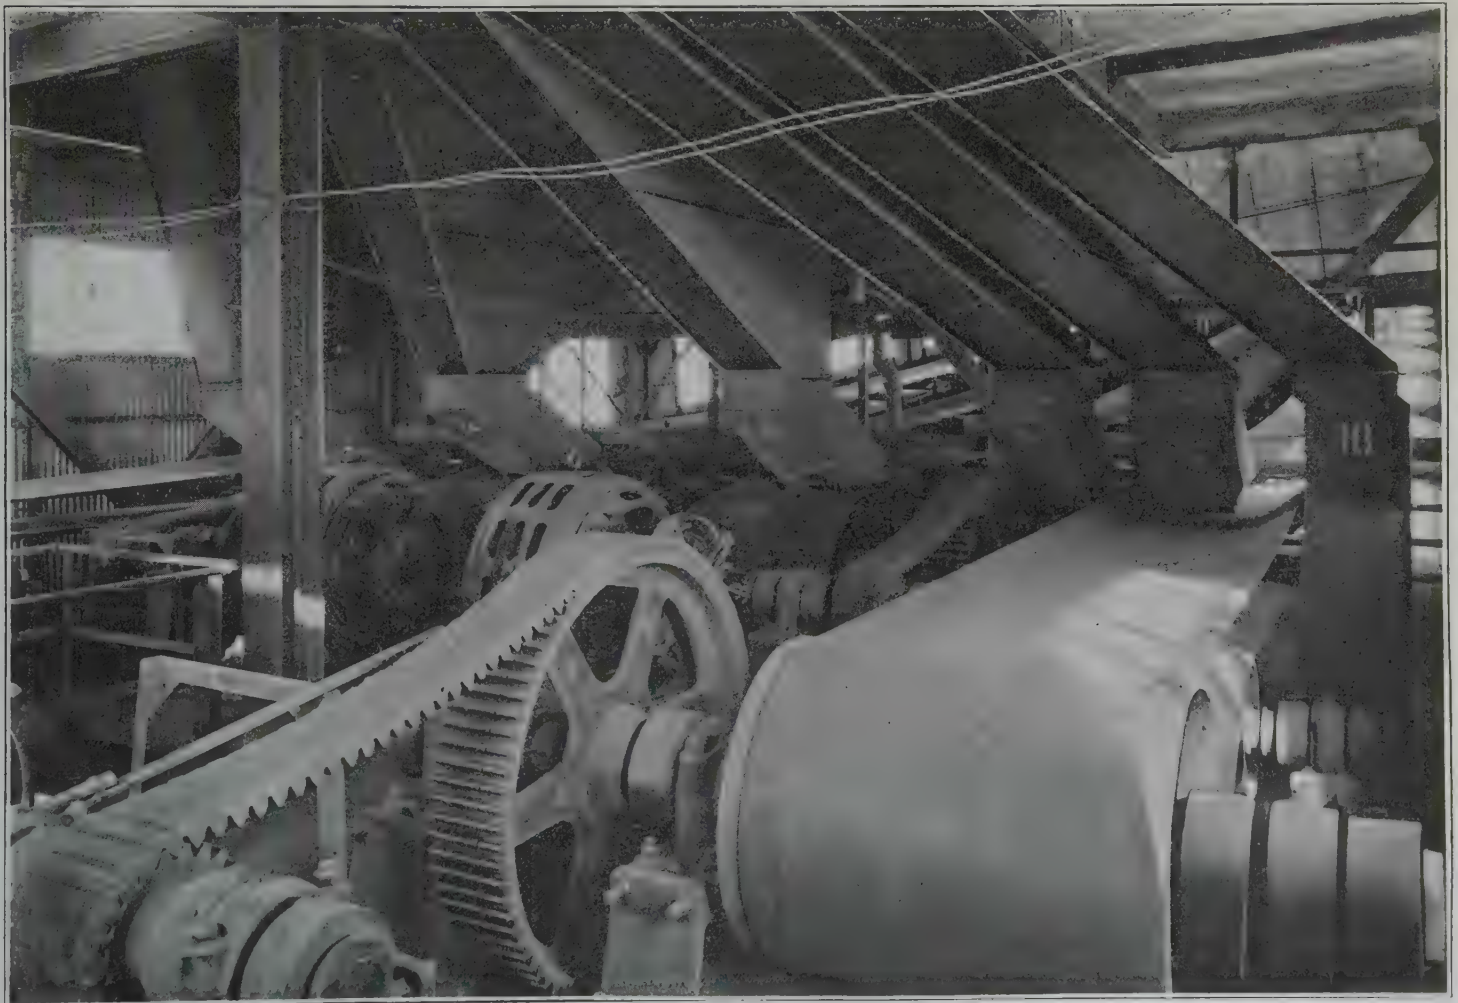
B. & O. Elevator. Sixth Floor Tower "B" Spouts Leading to Six Belts Which Carry Grain to Pier 7 and to Pier 6.
